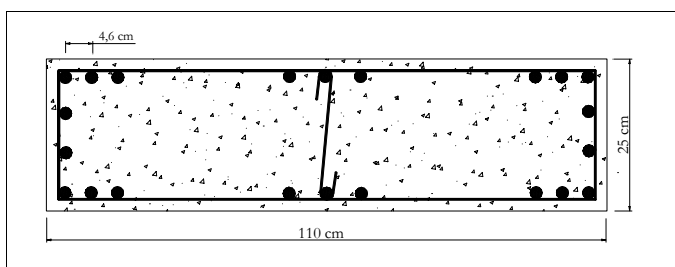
Case 3: Arrangement of reinforcement in cross section of column P1.
